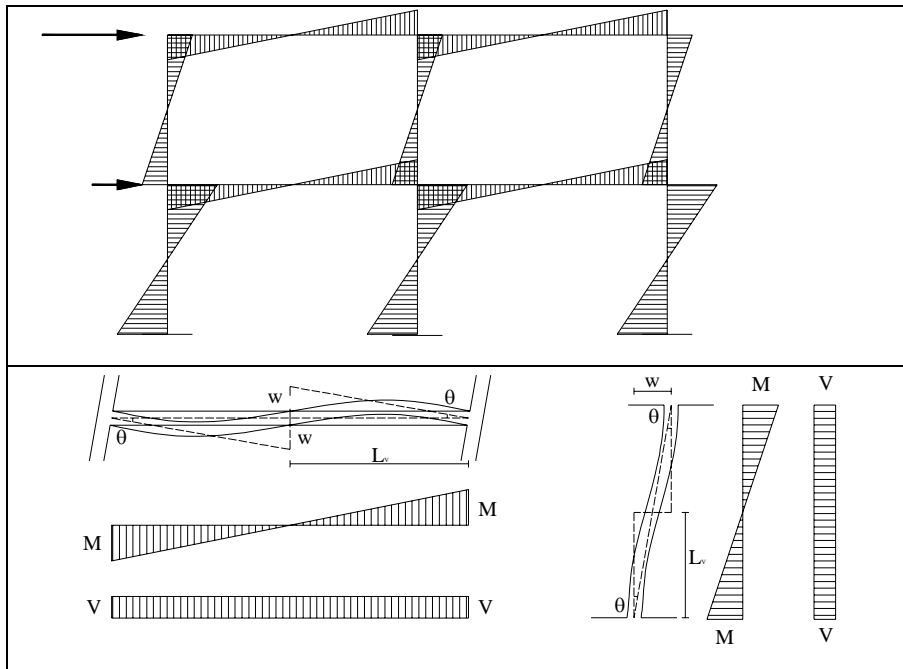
Moments and deformed shape of frame beams and columns under horizontal loads (Verderame, G. [11])
